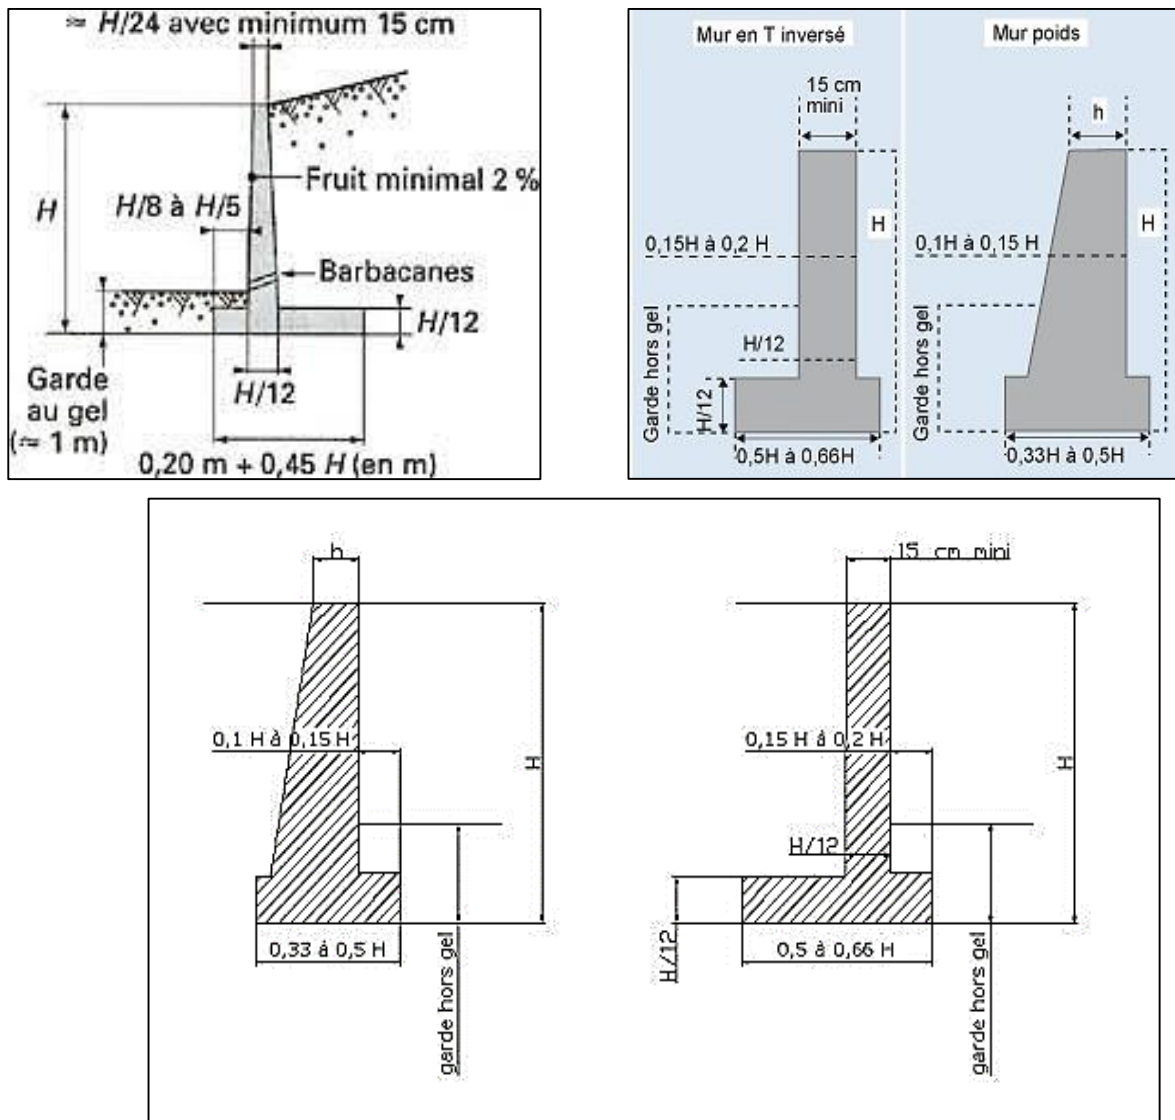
Typical dimensions of gravity walls and inverted T-walls.
